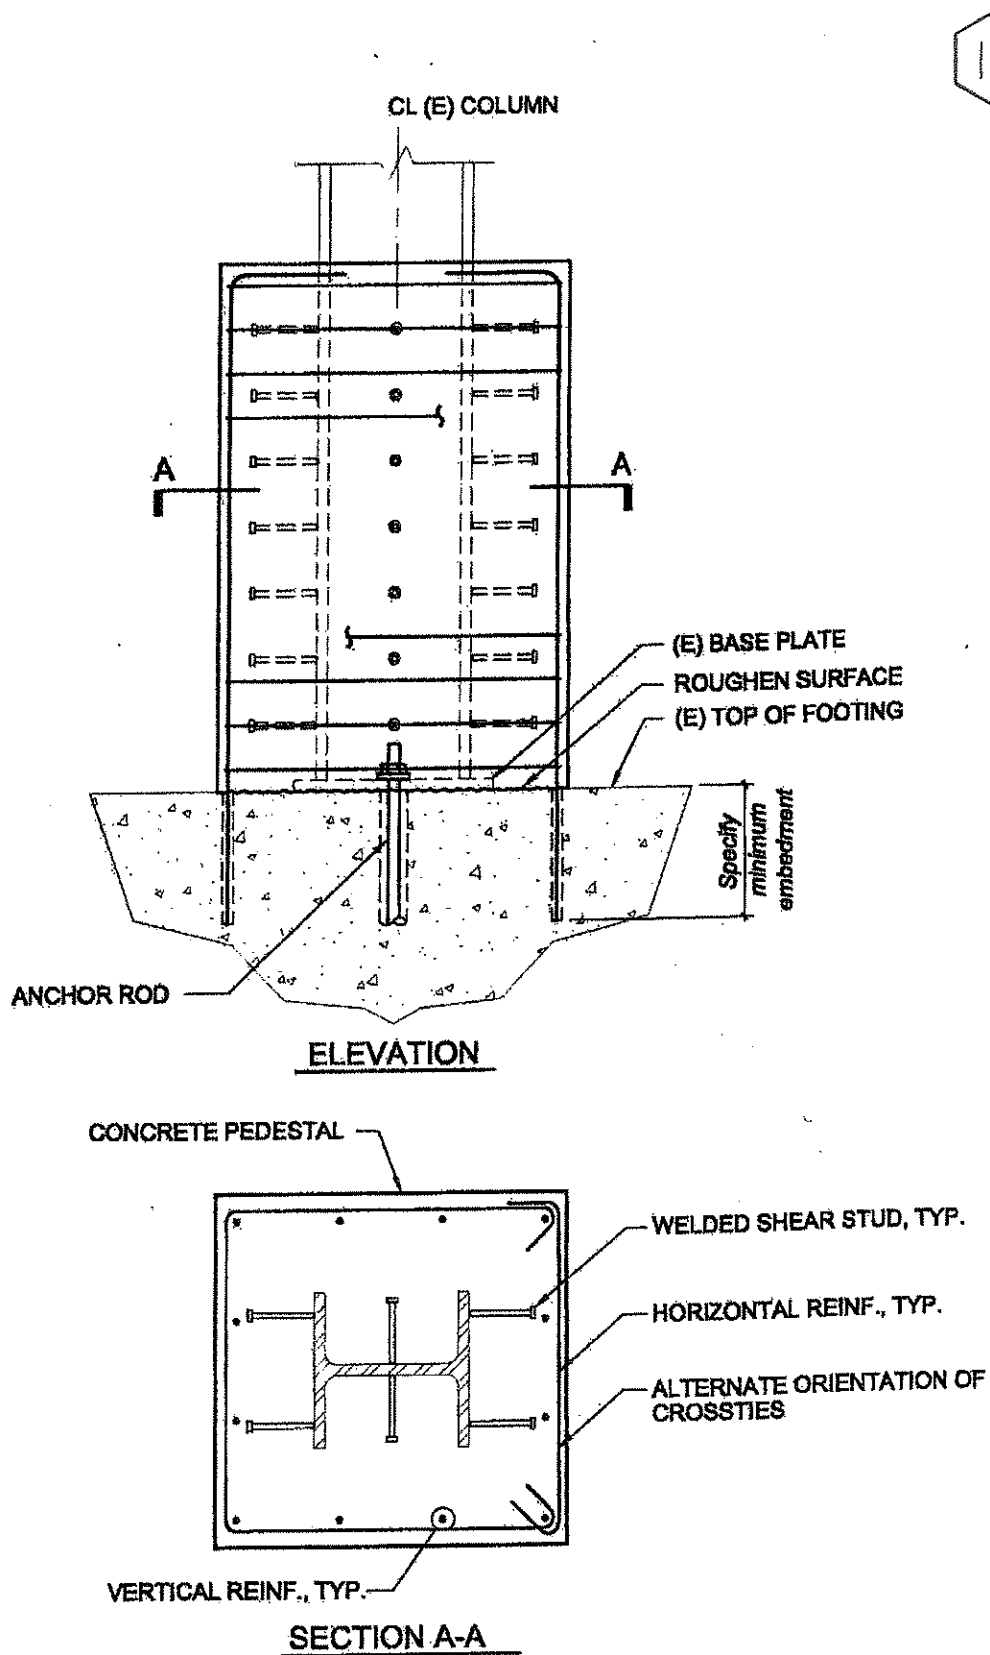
Concrete Pedestal at Existing Column
